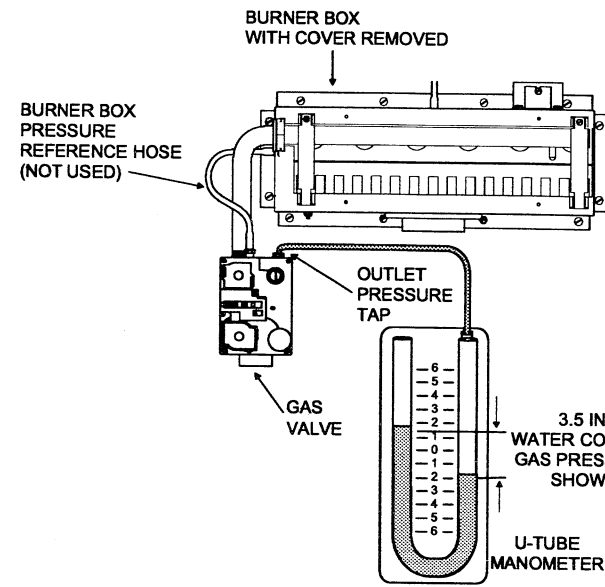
READING GAS PRESSURE WITH BURNER BOX COVER REMOVED
